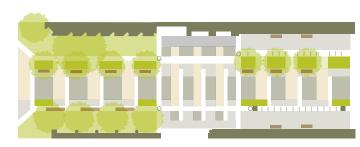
Campus street conversion, plan, Montgomery between Broadway and Park Avenues.
